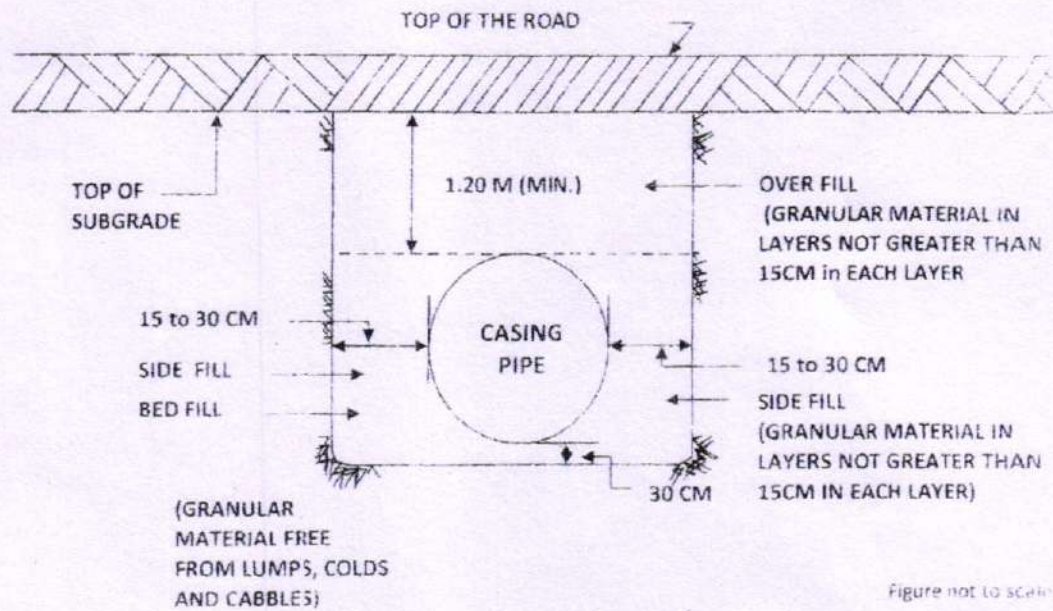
INSTALLATION OF CASING PIPE FOR CROSSING THE ROAD
